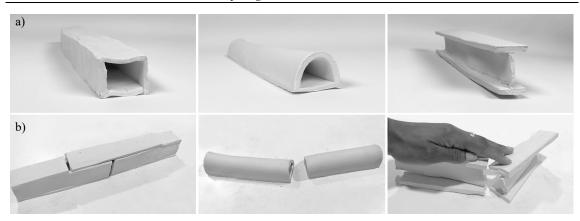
a) clay models of different beam cross sections, b) beam failure after load testing [Arch 557 Structural Principles in Architecture course developed and taught by Maged S. Guerguis, Fall 2019]
